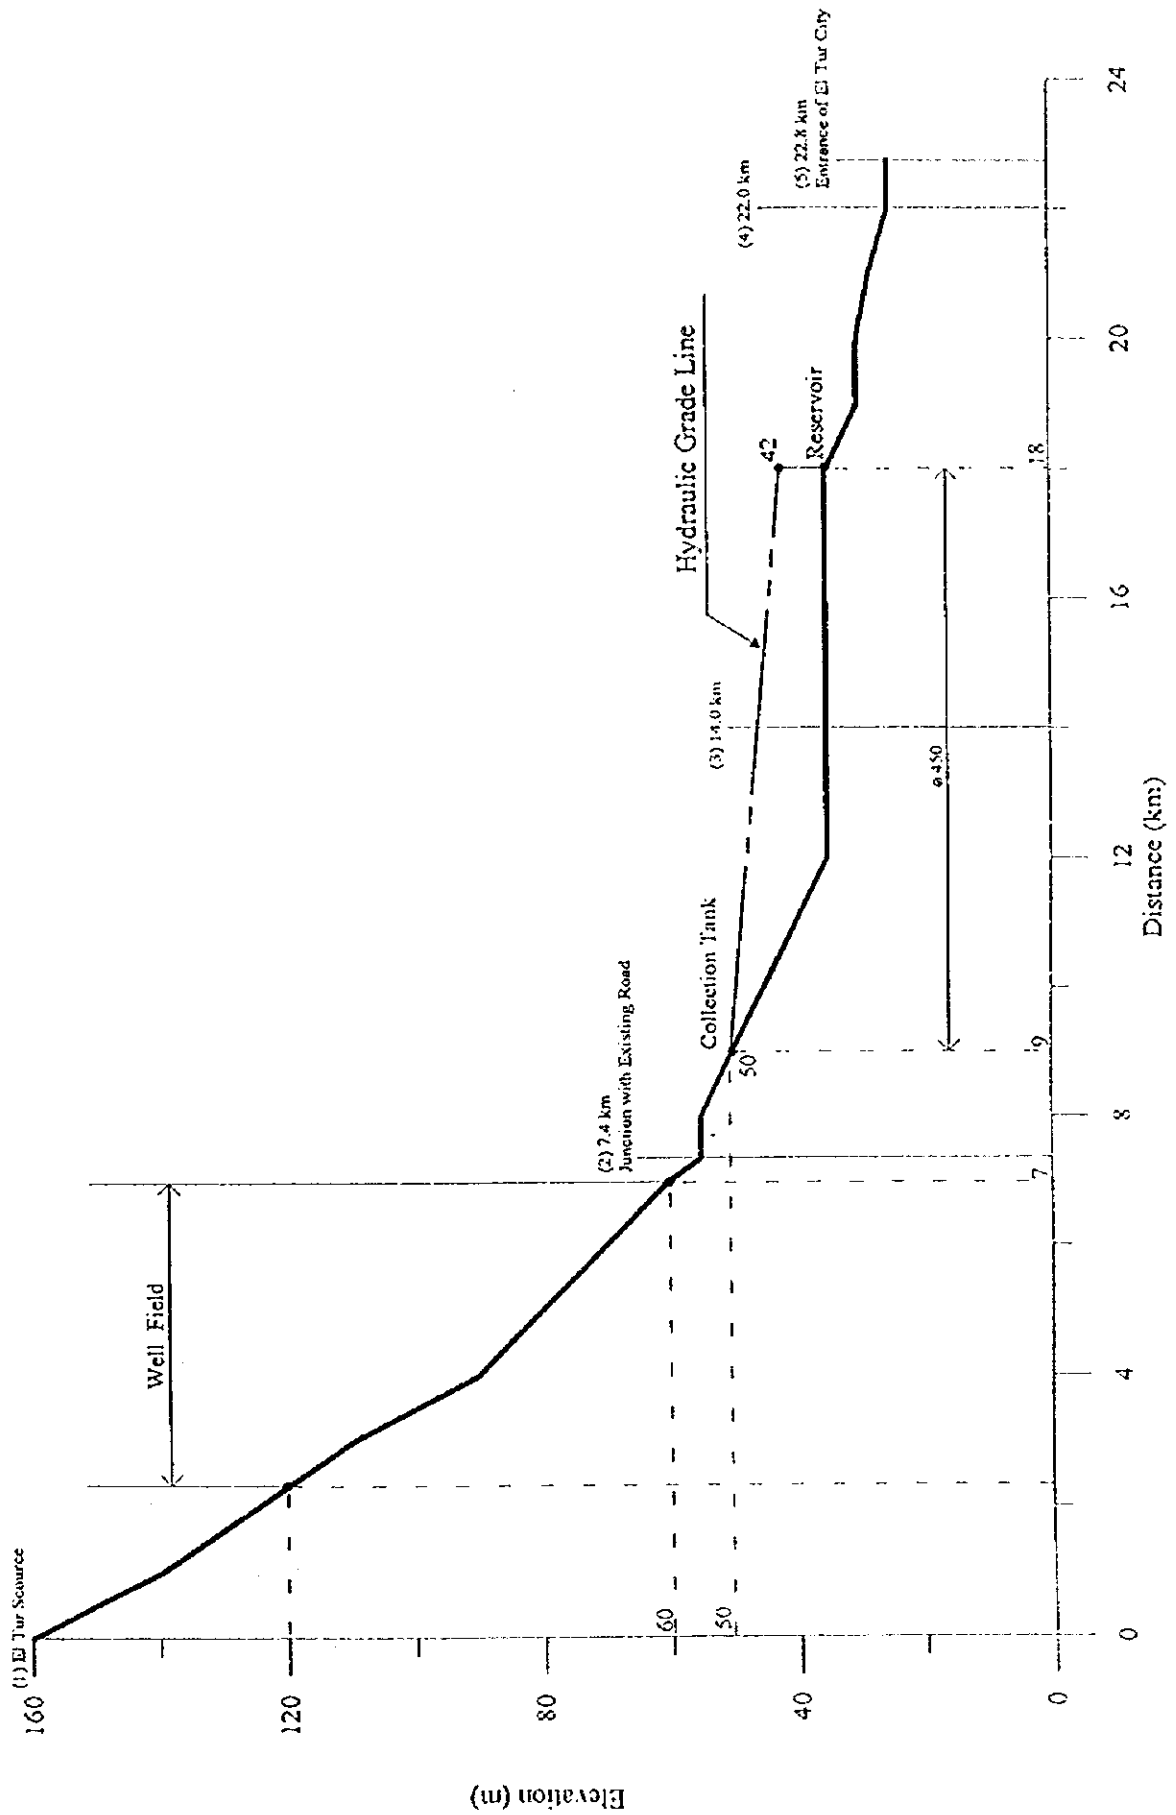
Longitudinal Profile of Conveyance Pipeline (Plan 3)
